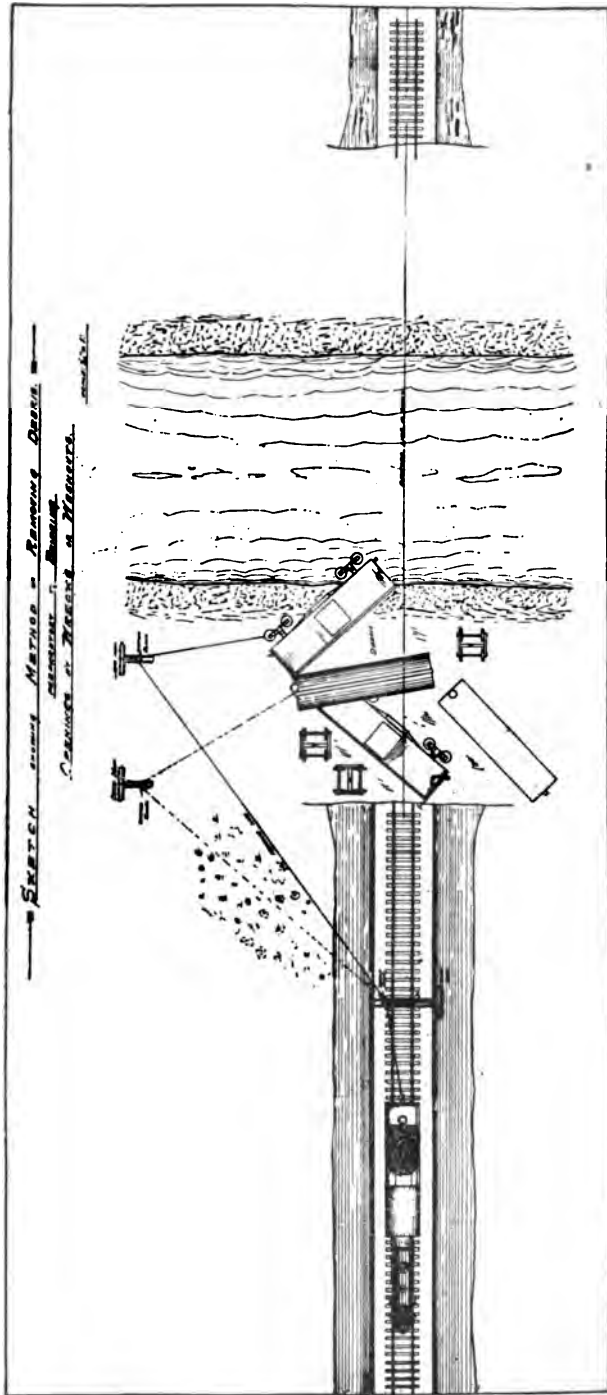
SKETCH SHOWING METHOD OF REMOVING DEBRIS AT WRECKS OR WASHOUTS.
